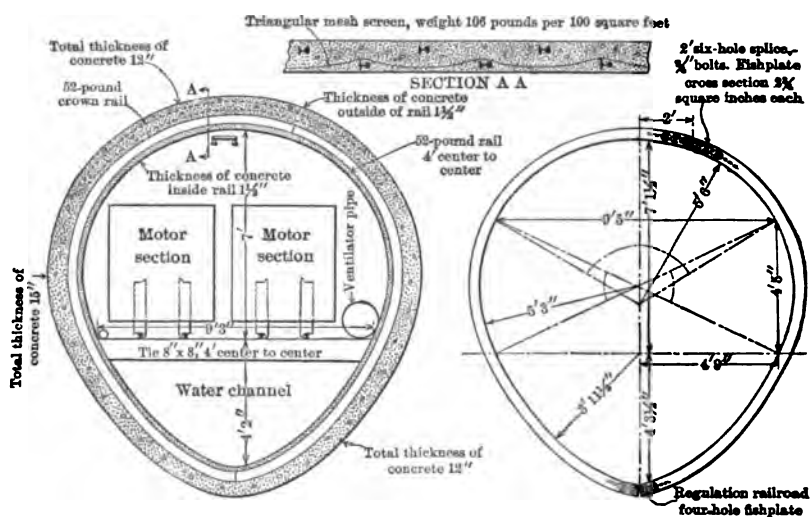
Reinforced concrete lining at Snake Creek Tunnel.
